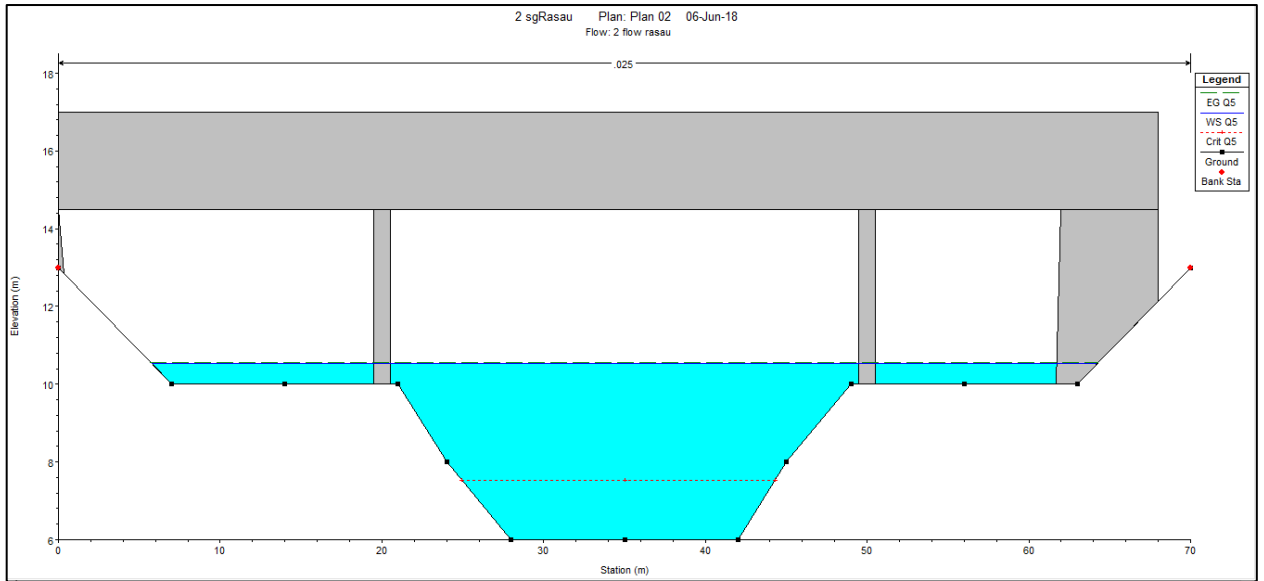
Water level at CH110 upstream of Rasau River (with bridge piers) – Q₅
